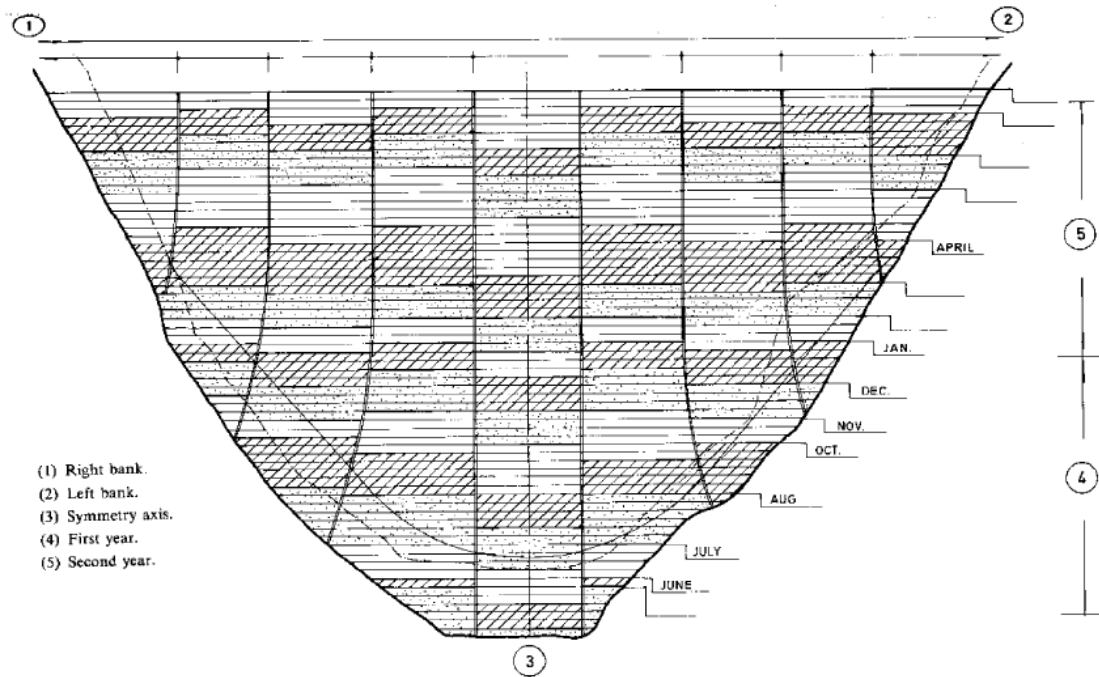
Concreting schedule of an arch dam (developed downstream view). Adapted from (Spanish Committee on Large Dams, 1990)
